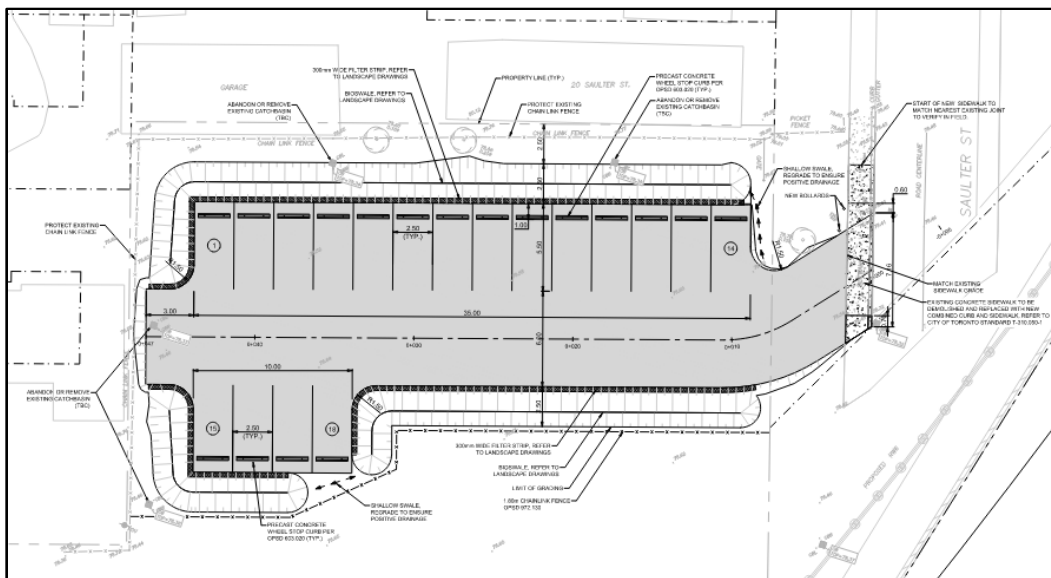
Replacement Parking Lot Layout at 356 Eastern Avenue Source: Metrolinx
